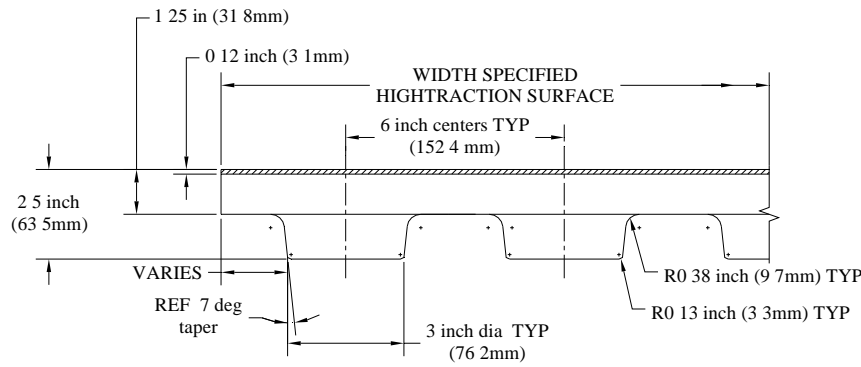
Typical synthetic decking Waffle-shaped cross section (dimensions are nominal).
